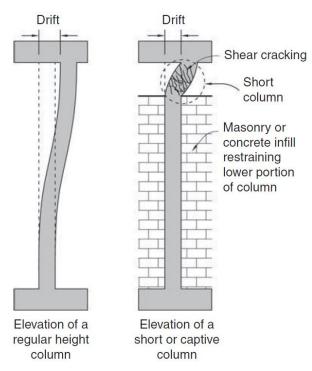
Short Column Occur When a Column is Partially Restricted from Deflecting Leading to Potential Damage in Form of Shear Cracking in the Unrestricted portion of the Column Under Lateral Force (Charleson, 2008)
